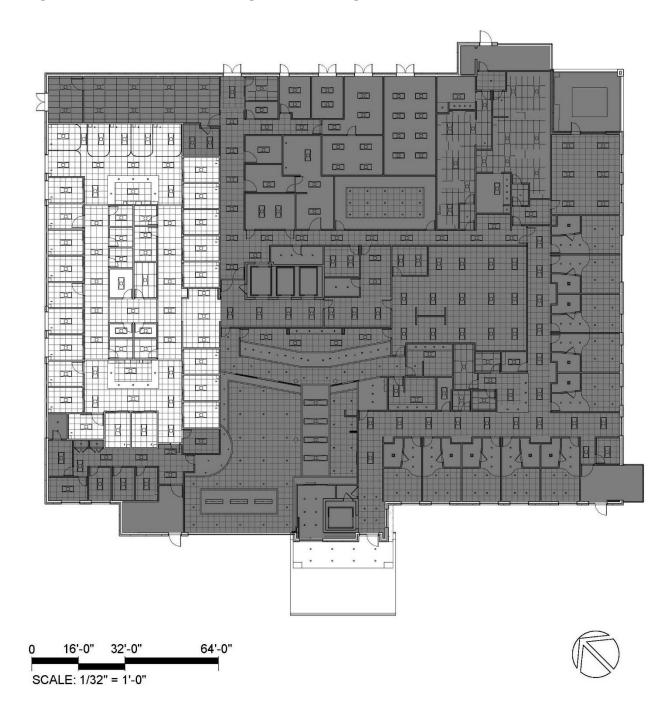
LVL 1 Reflected Ceiling Plan - Existing
